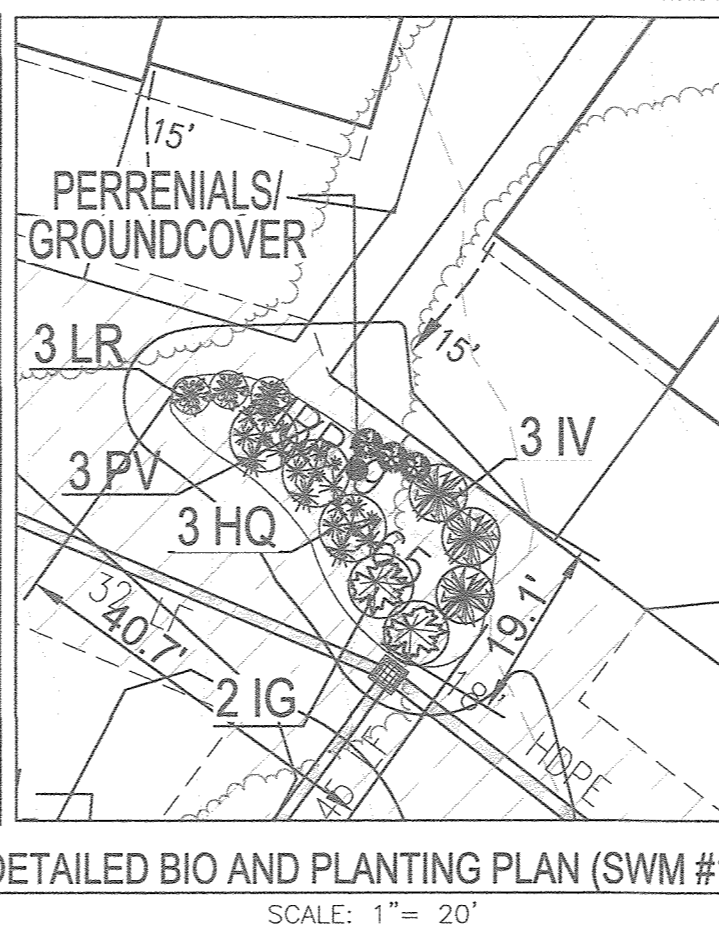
DETAILED BIO AND PLANTING PLAN (SWM #16)
